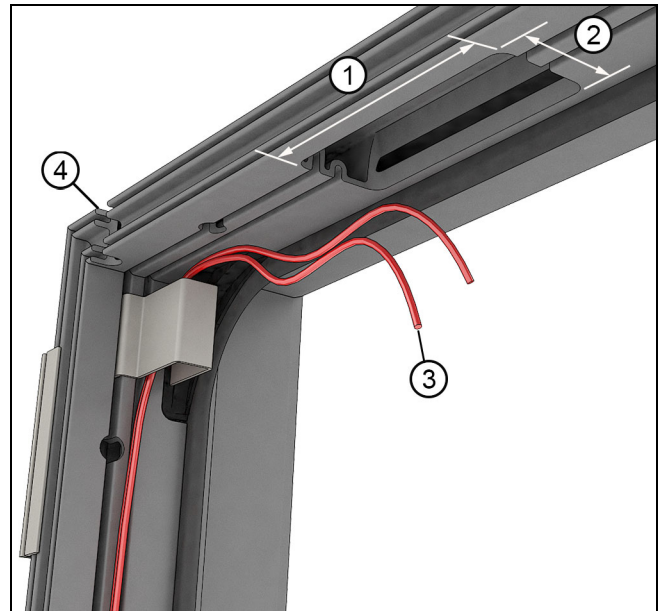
Head jamb transmitter pocket (jamb stop removed for illustrative purposes).
